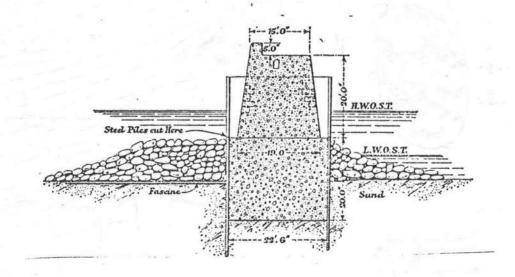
Dunkirk Breakwater: Typical Form in Shallow Water
